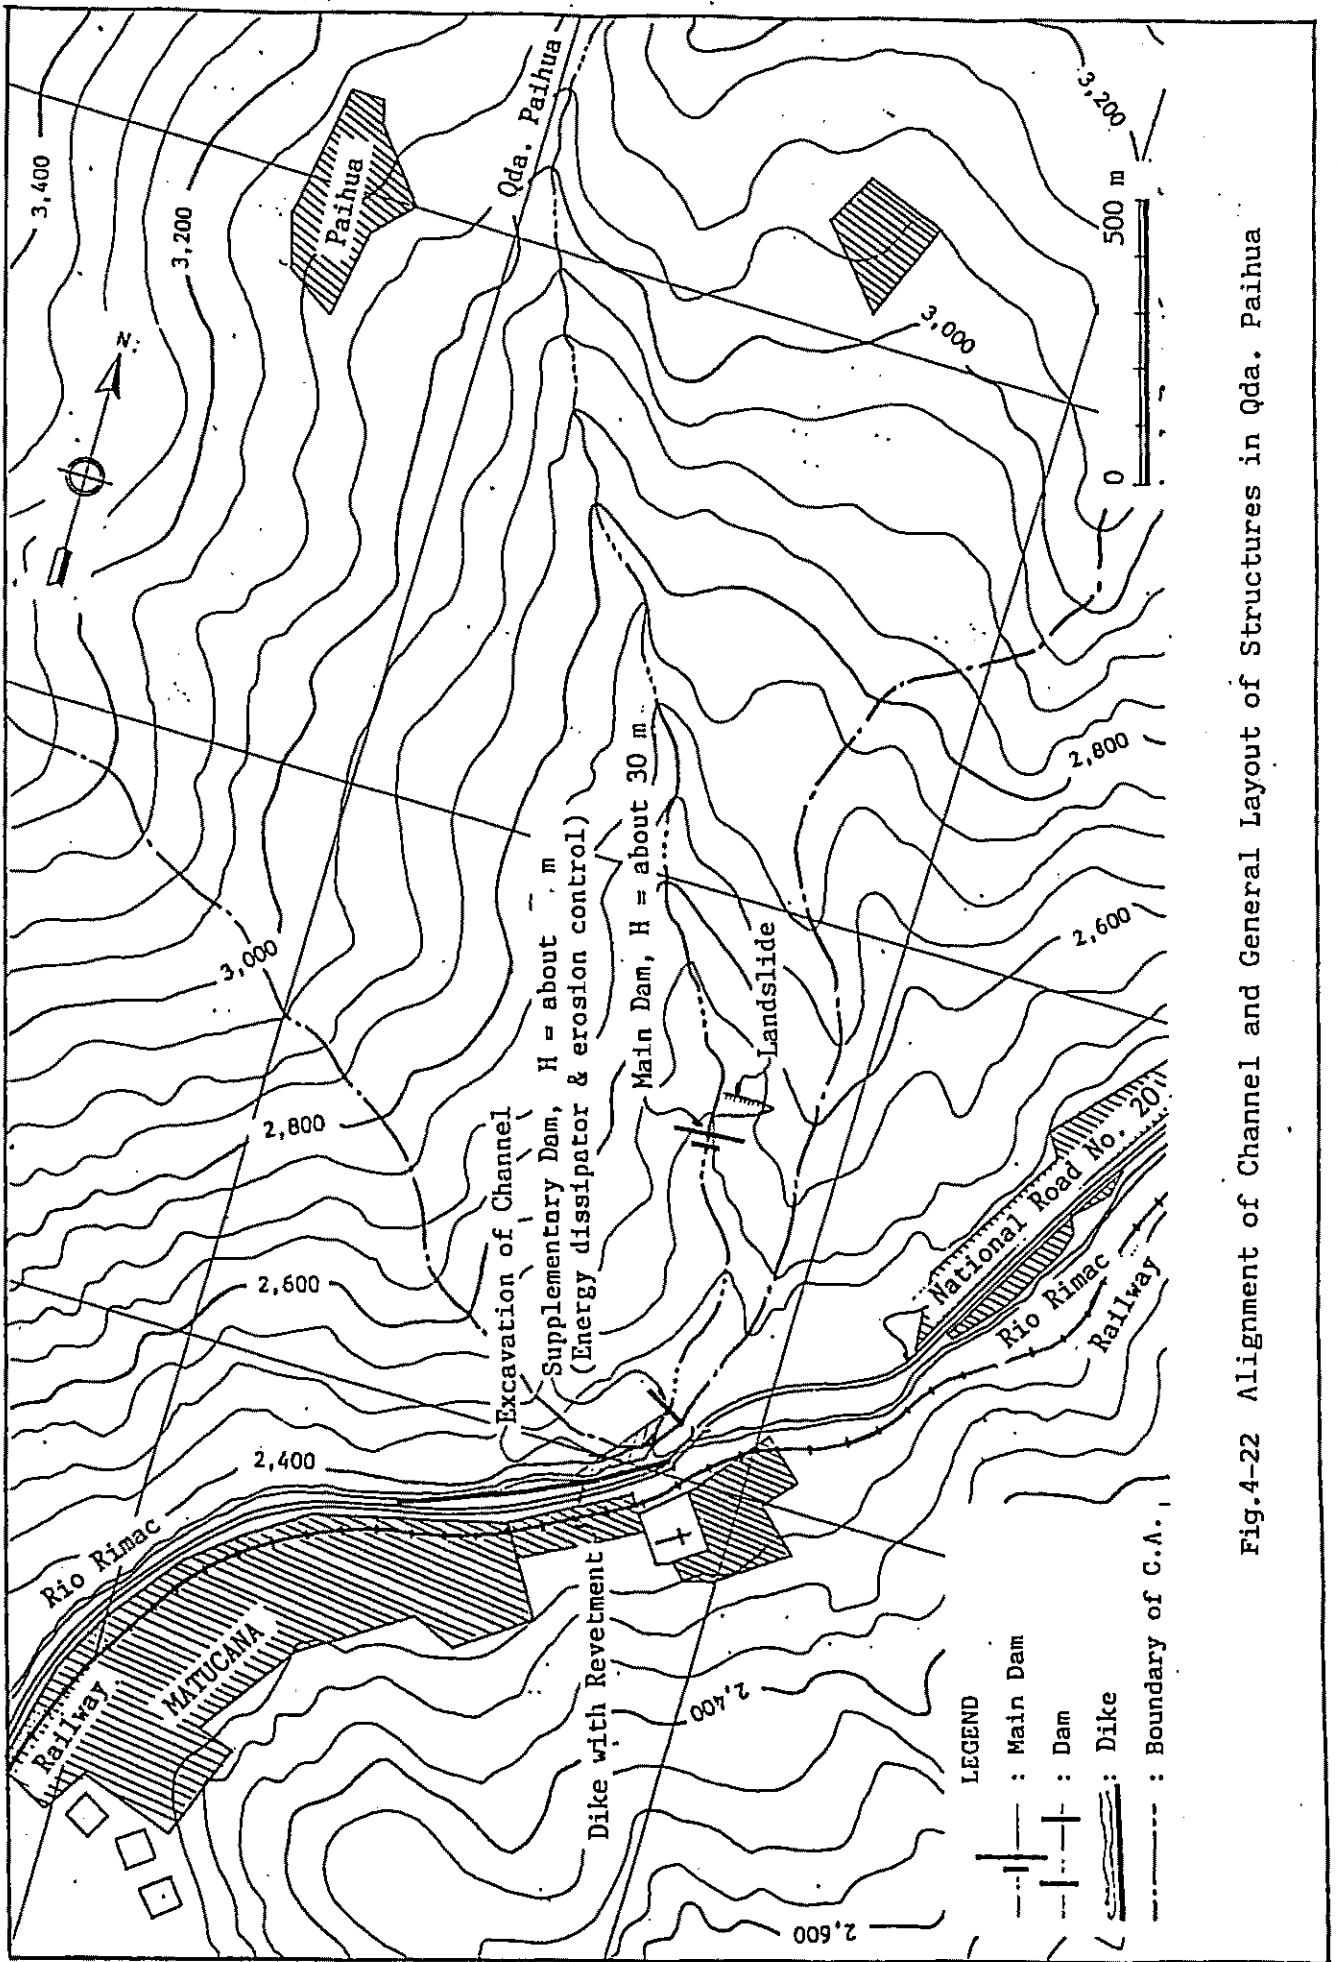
Alignment of Channel and General Layout of Structures in Qda. Paihua
